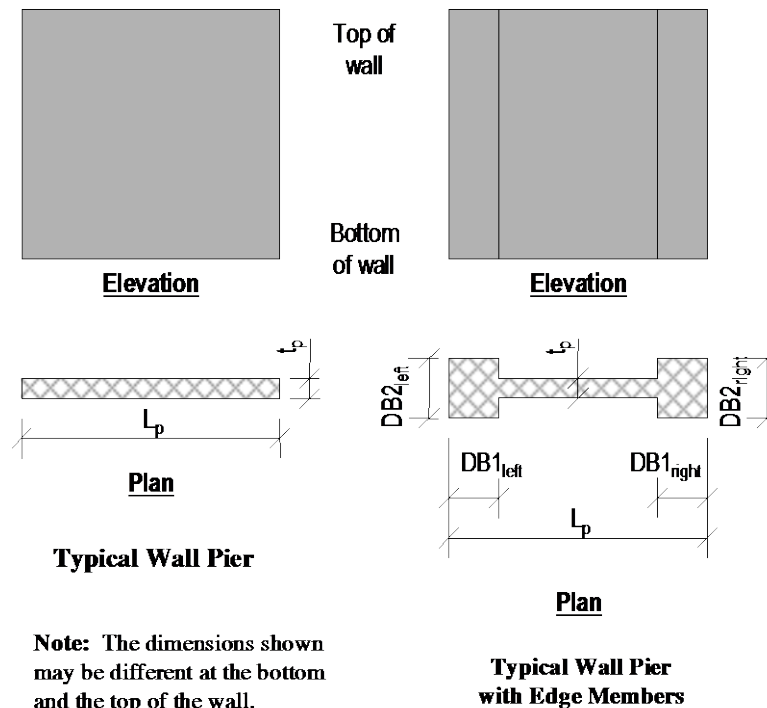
Typical Wall Pier Dimensions Used for Simplified Design
